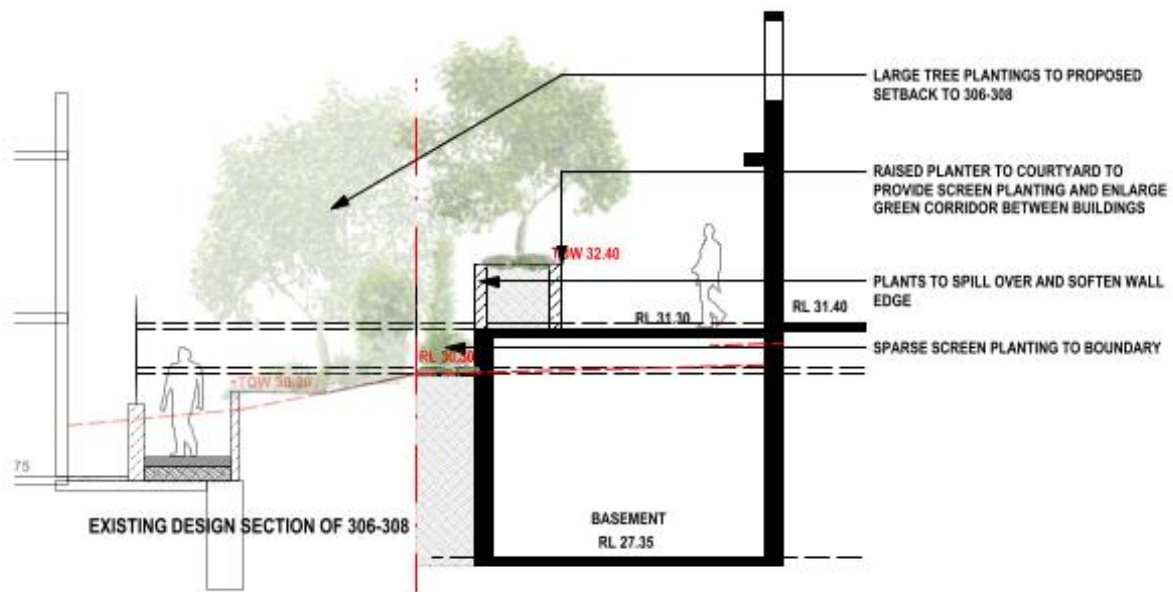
north-south section through the G.06 terrace and depicts the pathway and floor levels of the adjoining approved development at 306-308 Taren Point Road.
